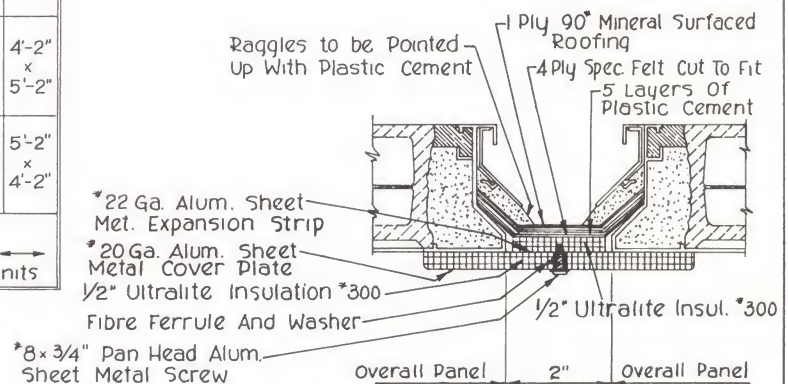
SECTION AT EXPANSION JOINT BETWEEN PANELS
